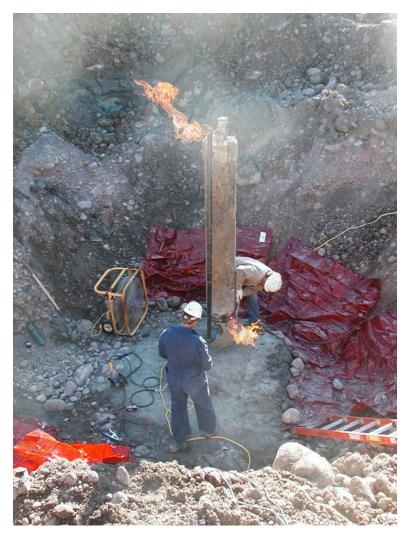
Hot-tap with welding blanket barriers, view southeast.
